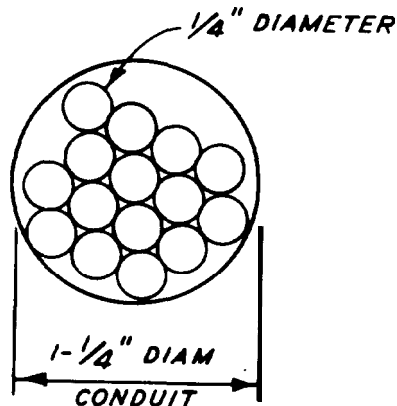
Method of Sizing Conduit to Hold Ten 1/4-in. Cables.
